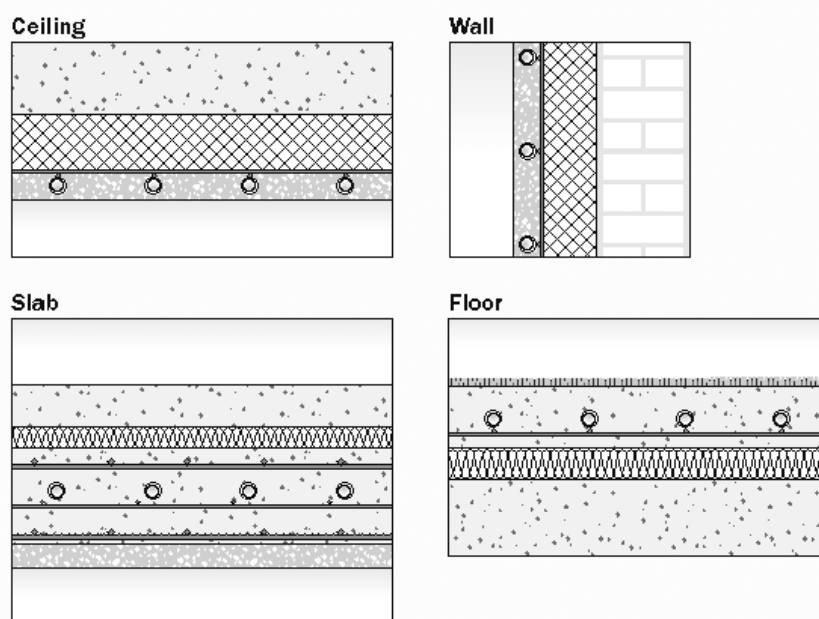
Examples of the positioning of pipes in floor, wall, ceiling and slab.
